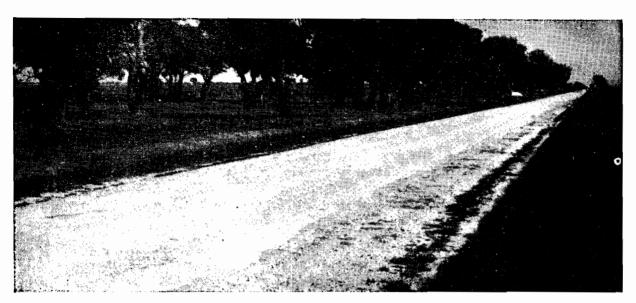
Construction and sealing on Borung Highway between Warracknabeal and Litchfield.
